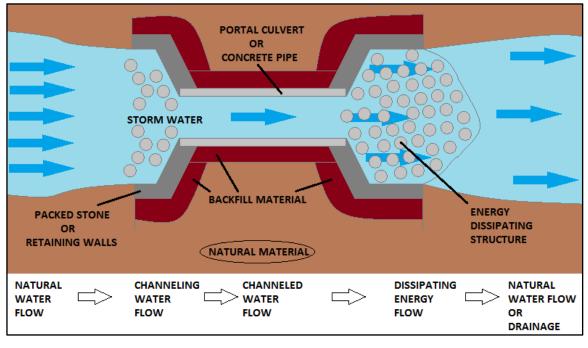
Diagrammatic example of portal culvert or concrete pipe – One of the options of crossing drainage channels (Solek, 2013).
